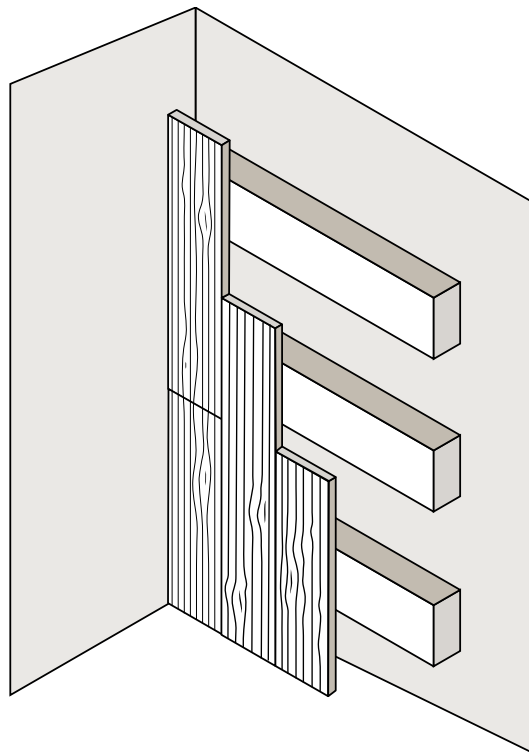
(right): The battens must be installed at 90 degrees to the direction of the cladding boards.
